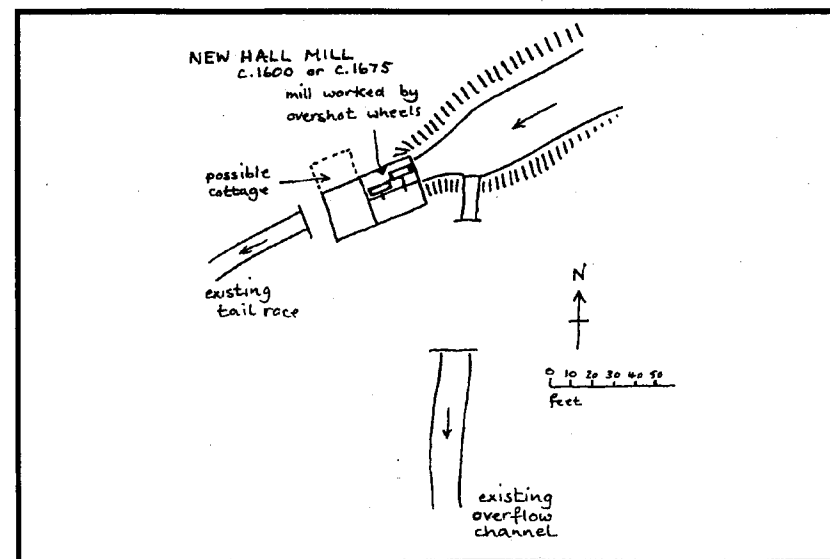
Conjectural site plan of New Hall Mill c.1600 or c.1675.
